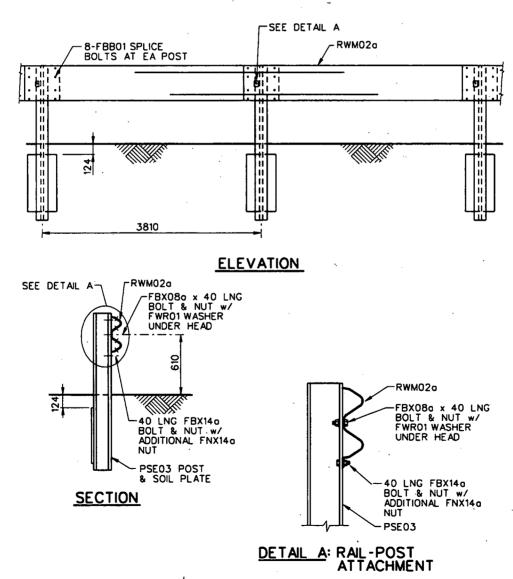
Weak-post W-beam guardrail (SGR02) (22).
